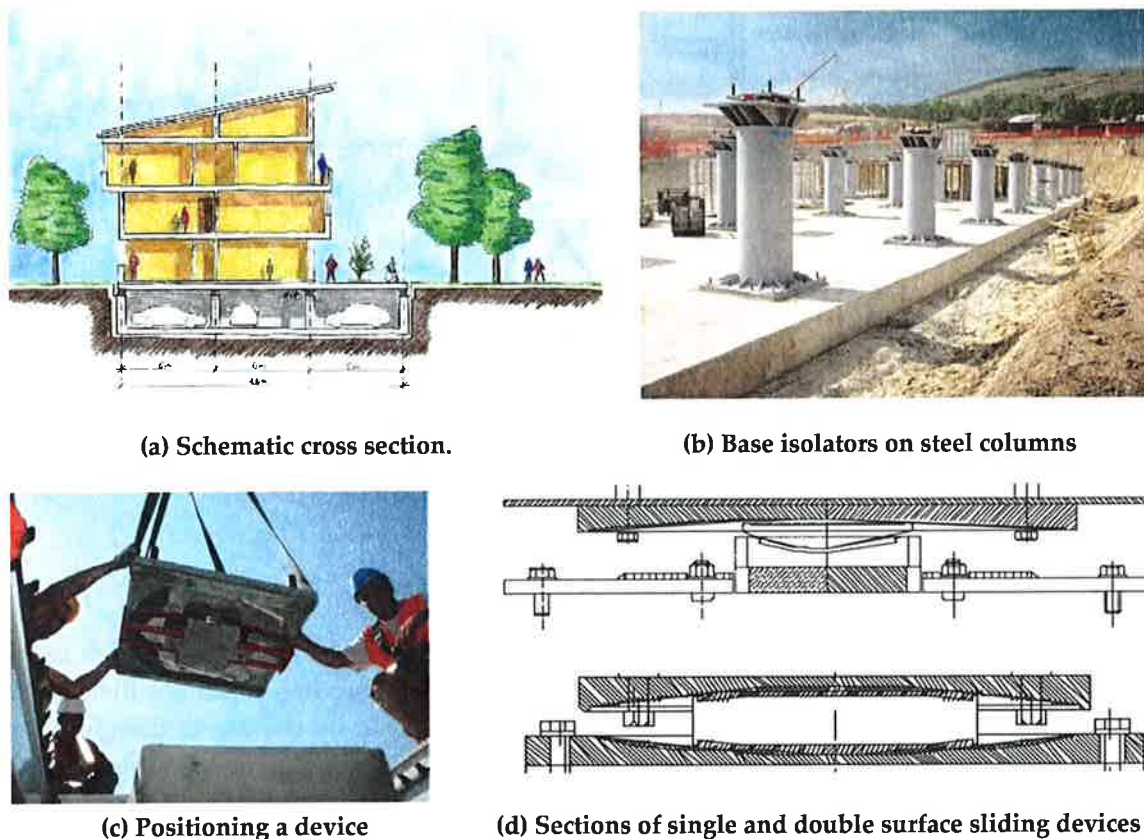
Three-storey residential construction on base-isolated ground-floor slab (Calvi, 2010)
